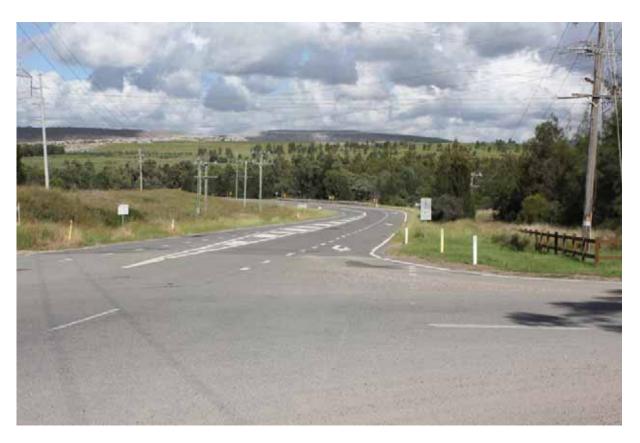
Golden Highway/Mitchell Line Road intersection looking west
